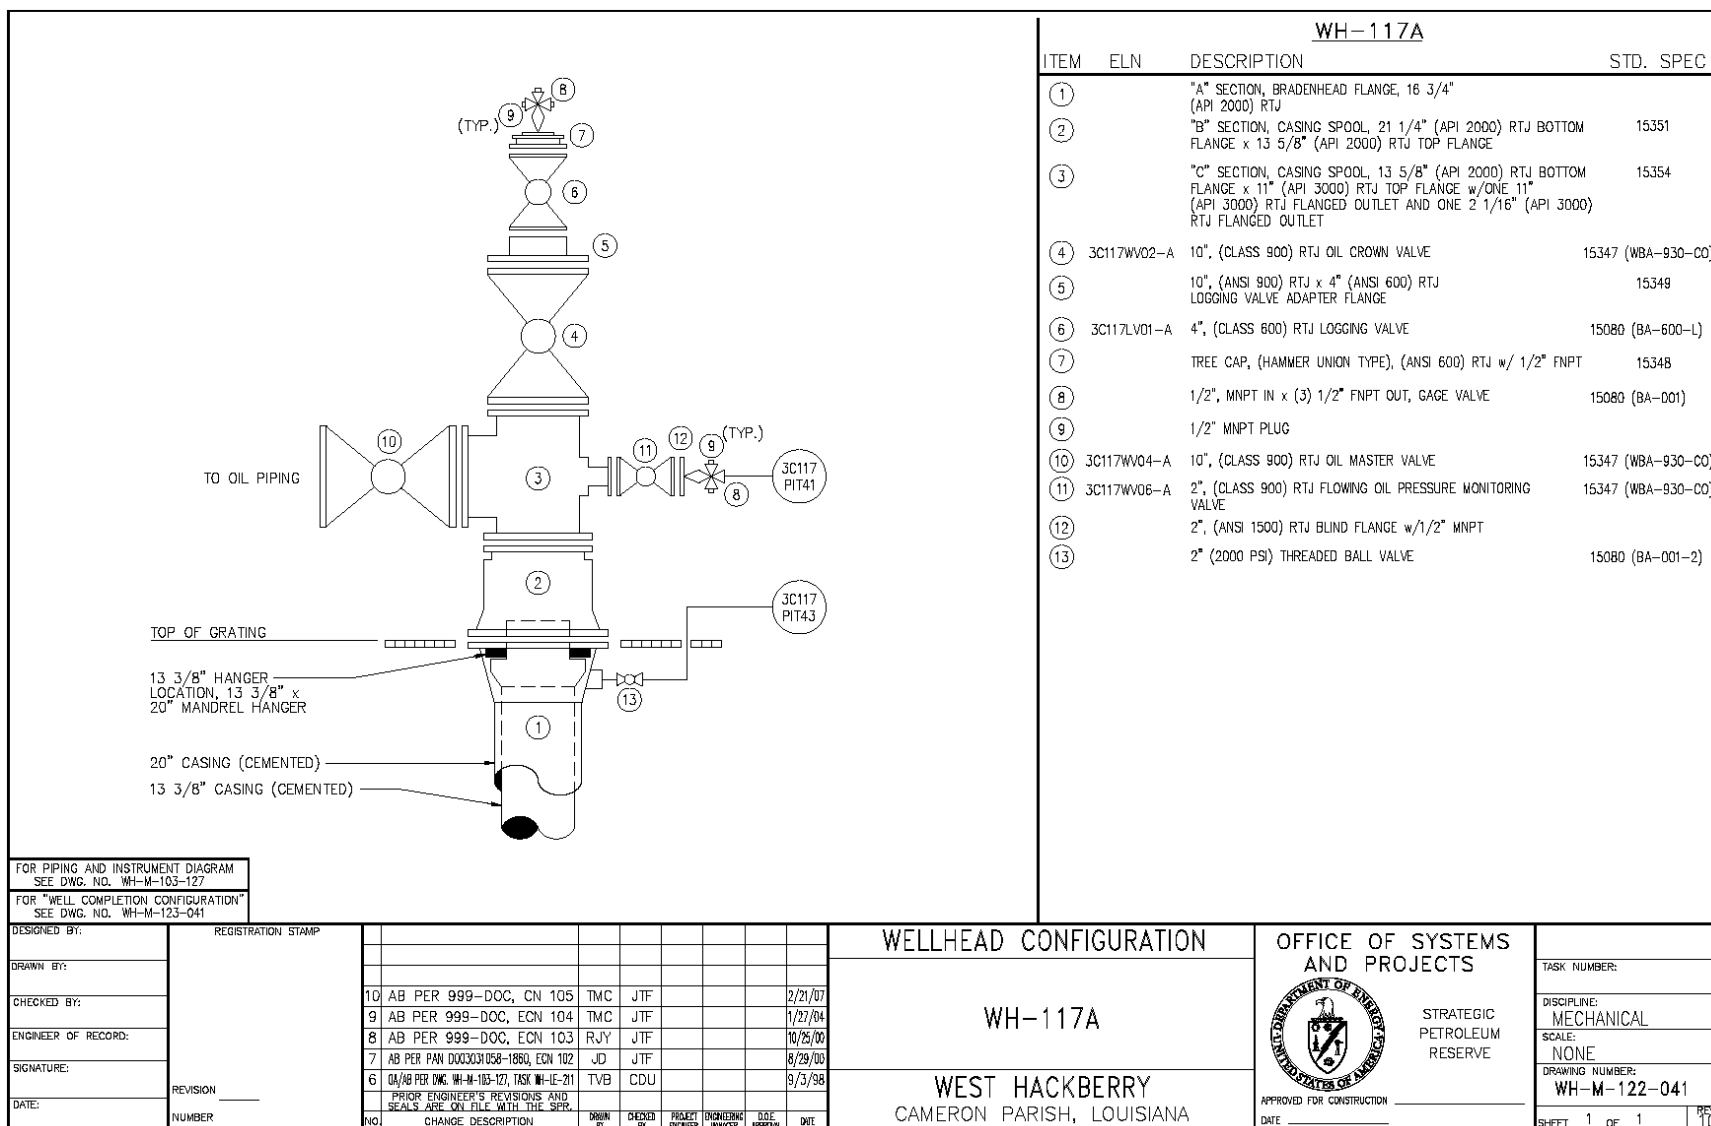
West Hackberry 117A, Wellhead Configuration Drawing, WH-M-122-041, 2/21/2007
